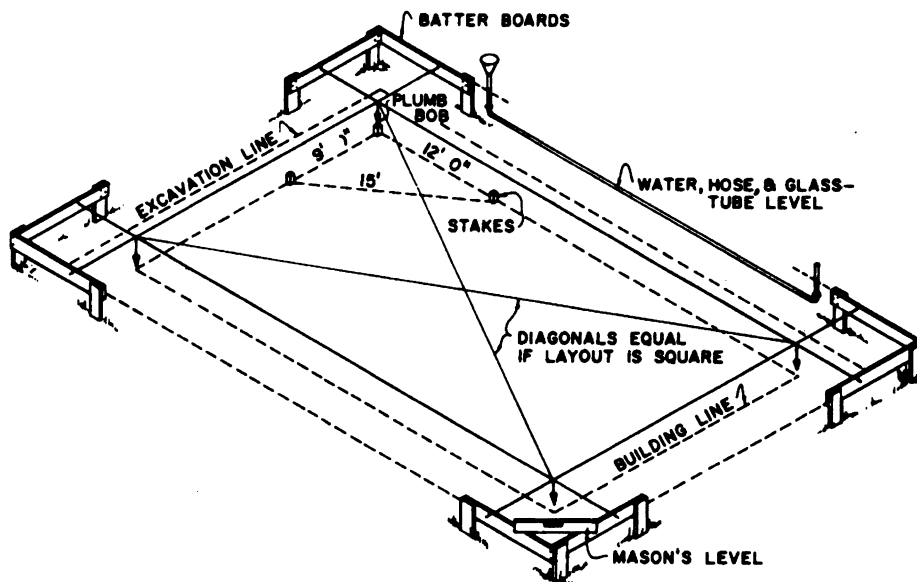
Layout of the building must be accurate. Square building lines, marking with stakes at corners. Mark limits of excavation with stakes. Position, erect, and level batter boards 4 to 10 feet from excavation lines. (Excavation lines should be at a sufficient distance from building lines to allow workman to apply surface bonding.) Attach lines to batter boards above building lines. After excavation is complete, building corners can be located simply by dropping plumb line from lines on batter boards.
